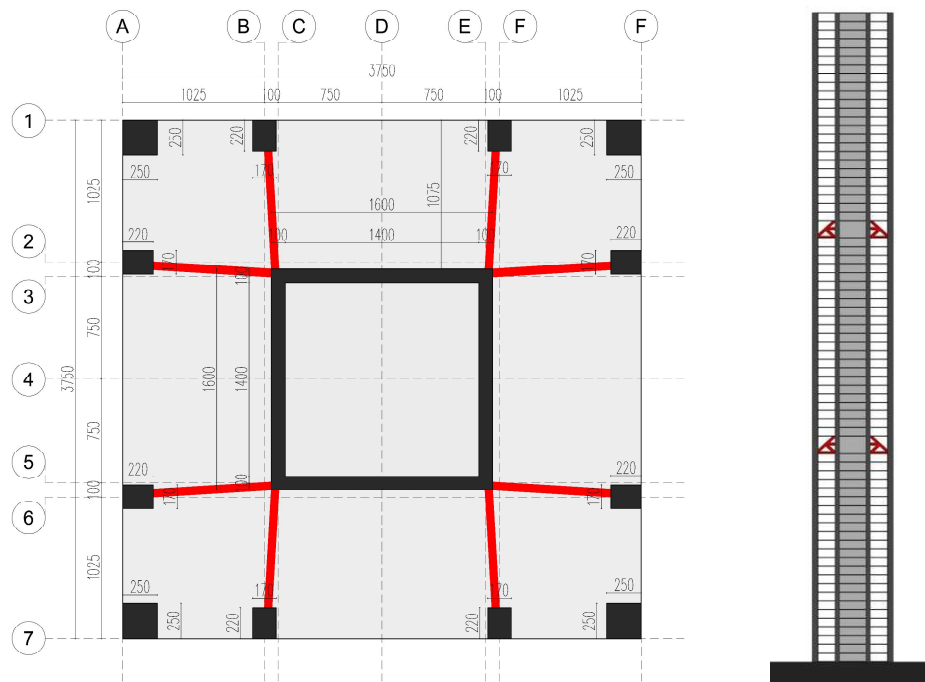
Typical floor plan and elevation of model "OF_OPT_2a" with outriggers
